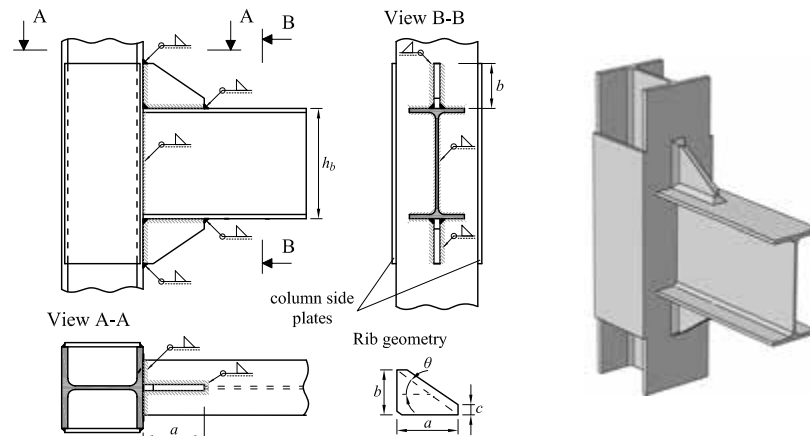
Welded RS beam-to-column joint details (concrete column encasement not illustrated)
